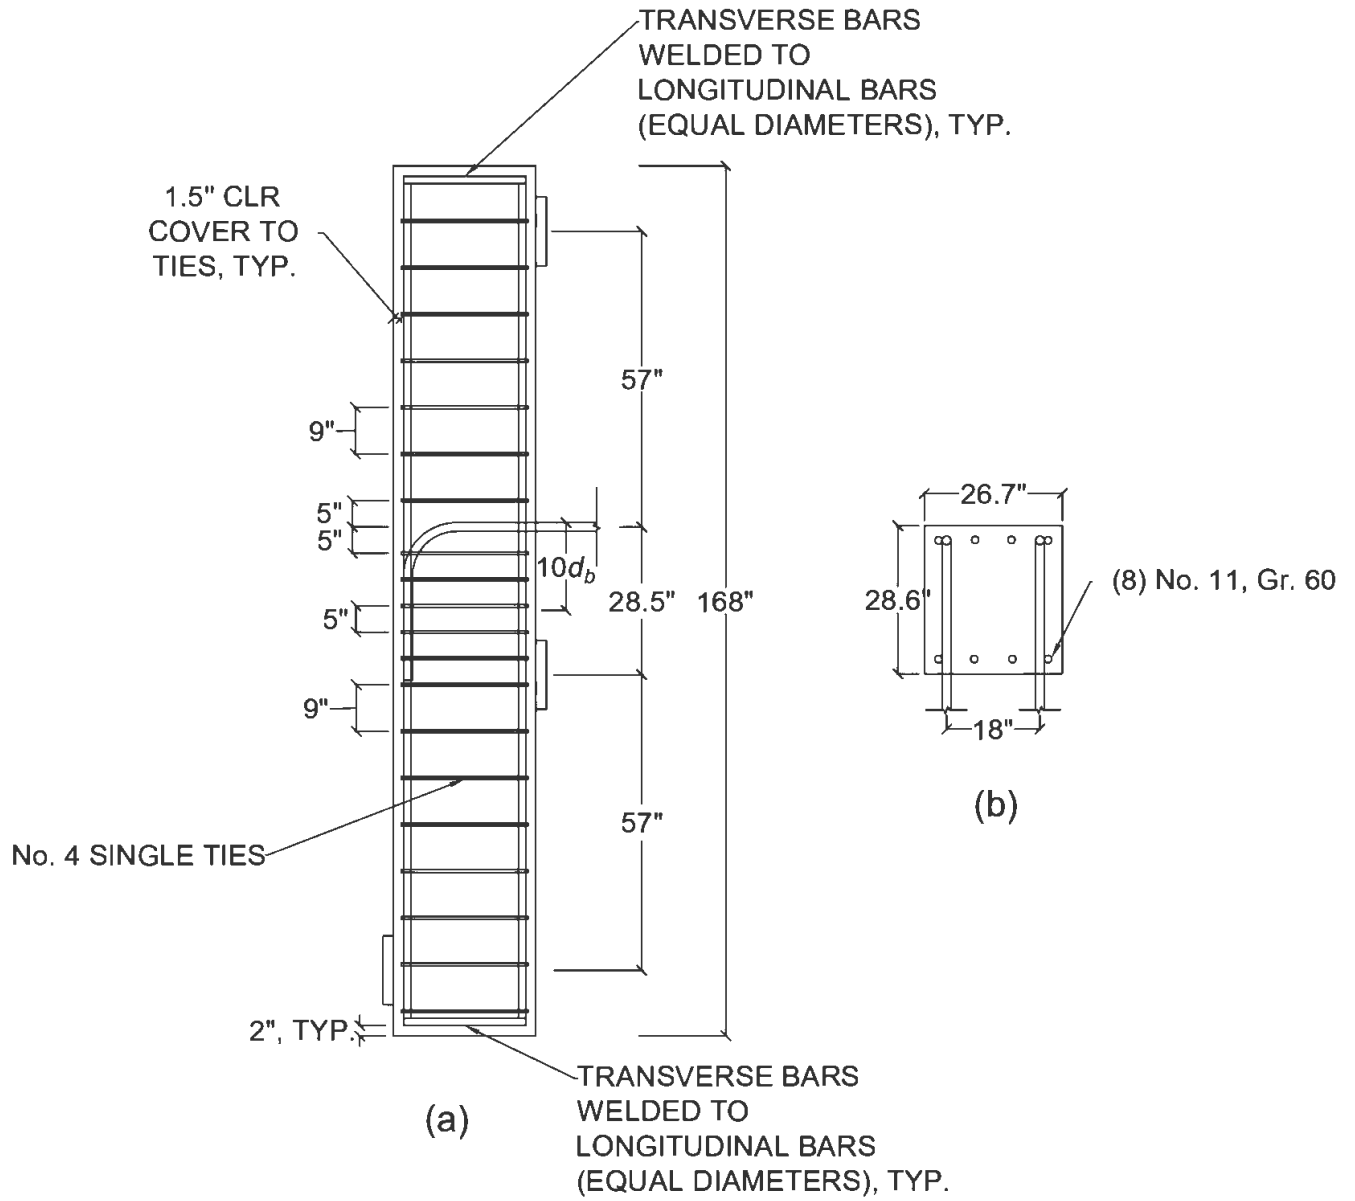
Details of reinforcement layout for No. 14 hooked bar specimen H14-2: (a) elevation, (b) cross-section
